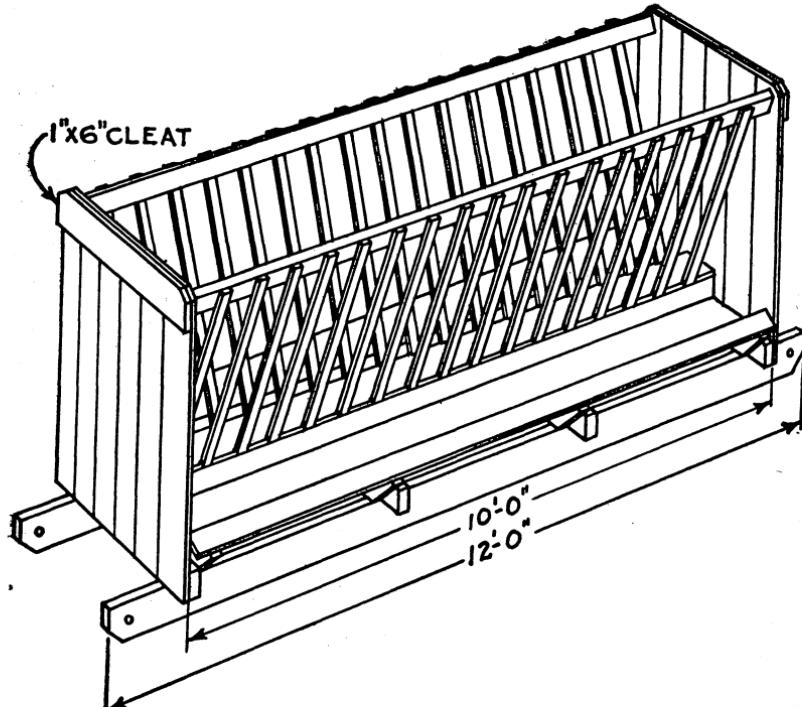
Detailed plan for construction of hayrack shown in Figure 14. (Design No. 2009)
